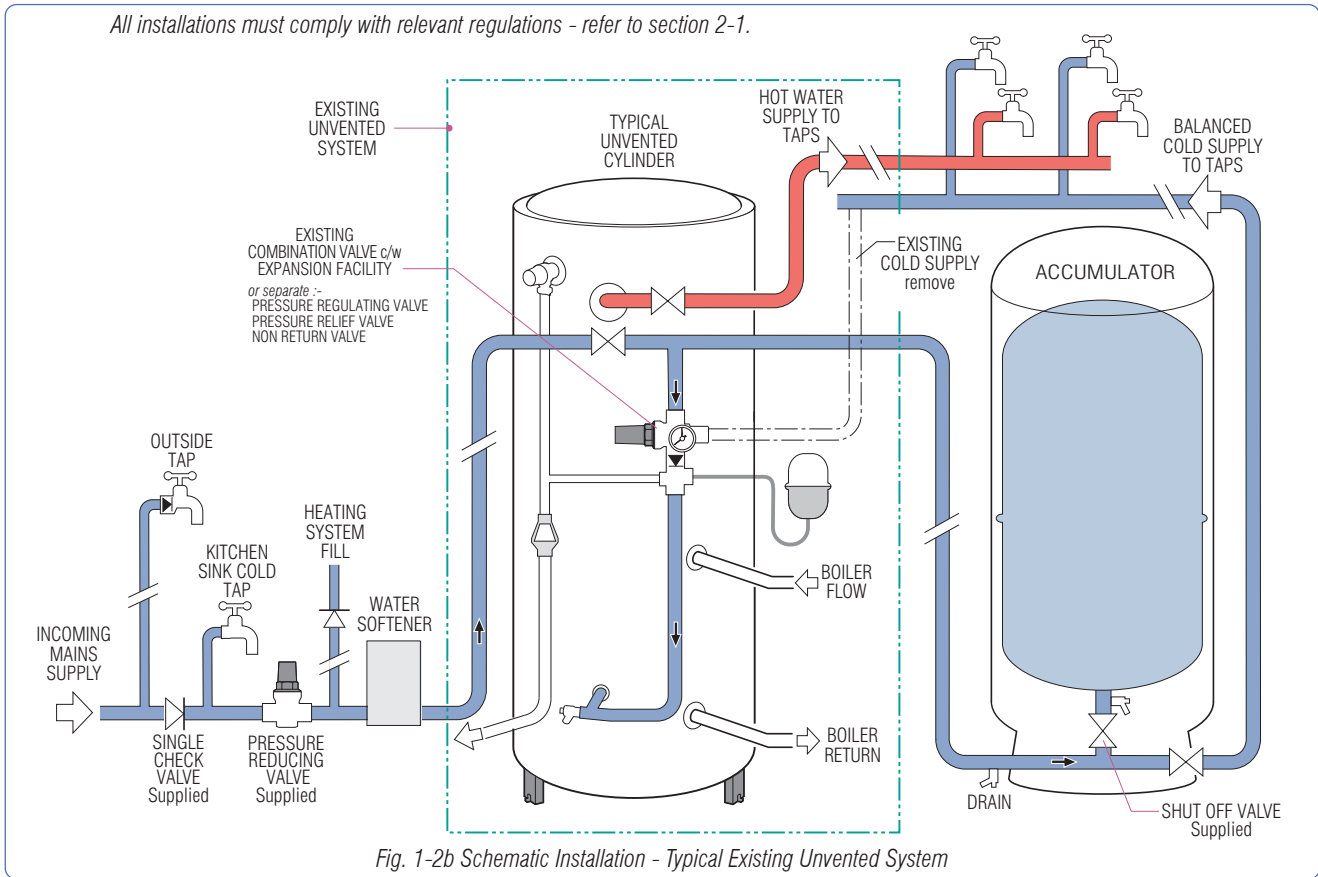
Schematic Installation - Typical Existing Unvented System
